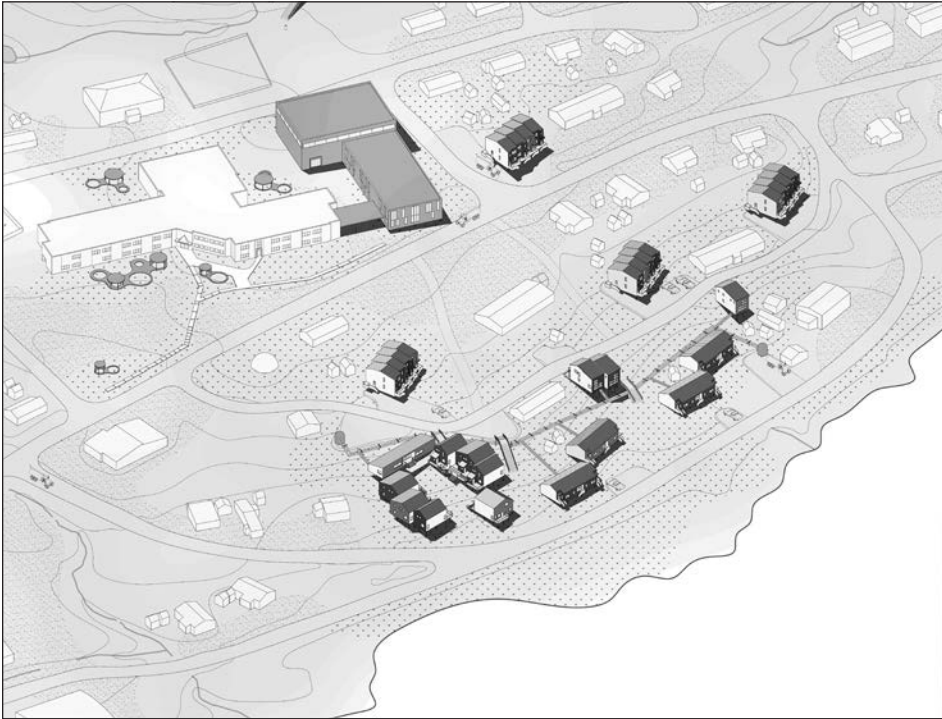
Consolidation strategy. New houses are added in the village center, with utilidor and pile foundations. Design: Landry and St-Jean, 2017.
